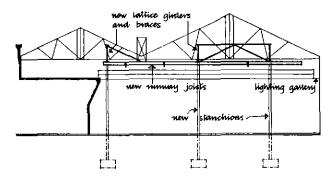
Diagrammatic section showing method of supporting runway joists and motorized lighting equipment
